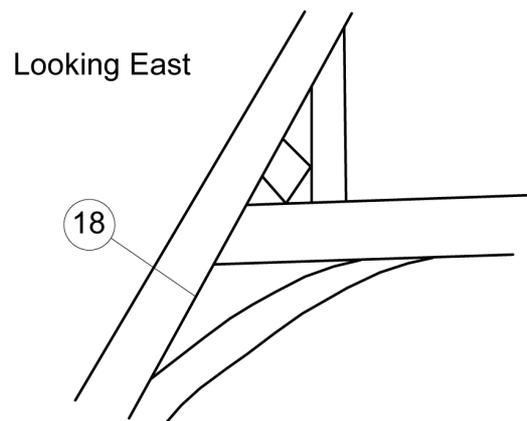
Sketch showing the location of sample SWM-F18 from truss C in the hall range roof
